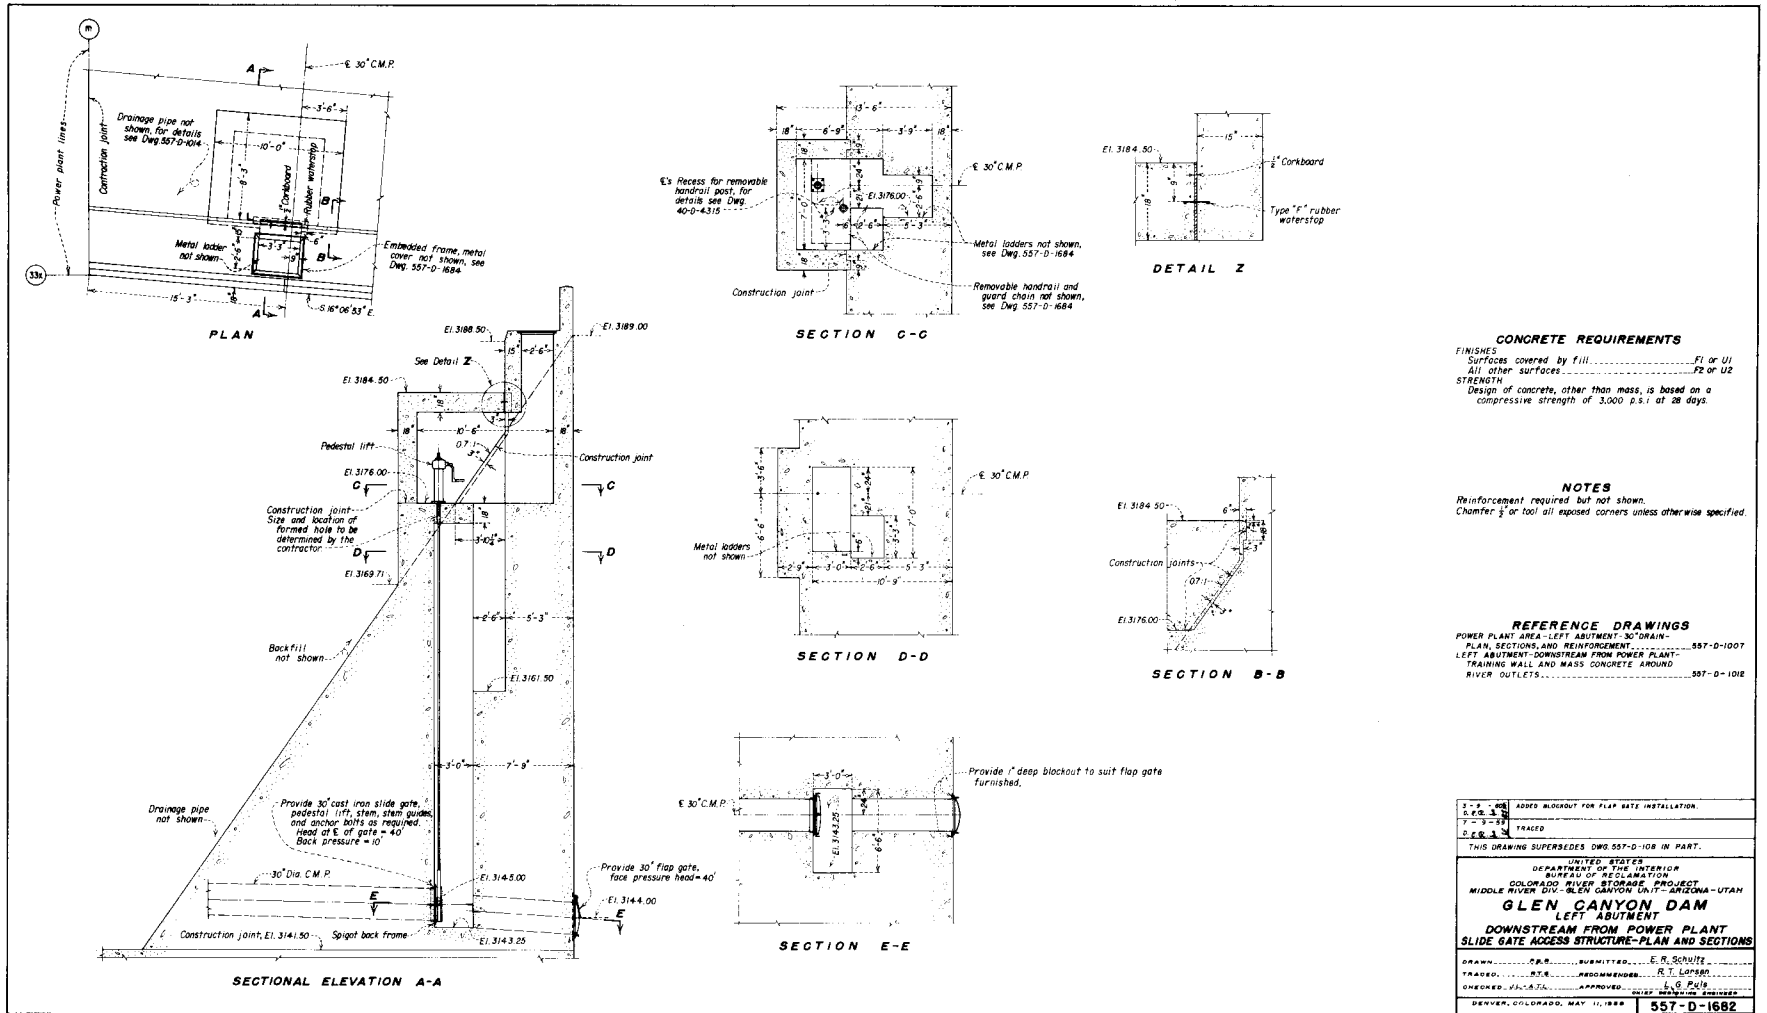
Left abutment of dam downstream from powerplant—Plan and sections of slide gate access structure.
